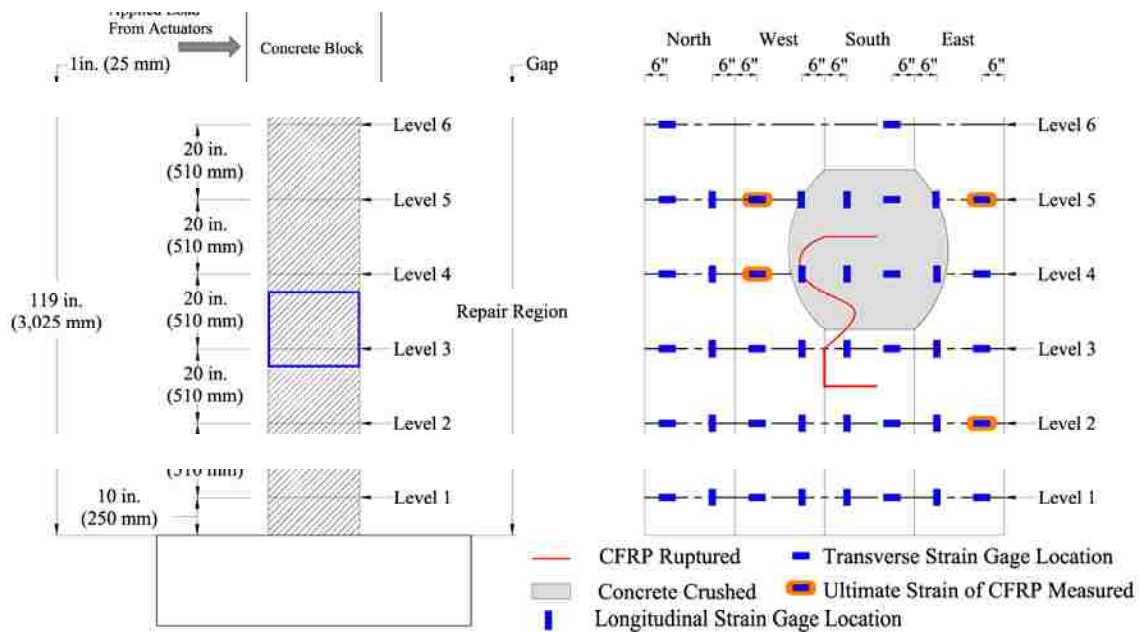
CFRP strain gage layout and relation to repaired column damage location.
